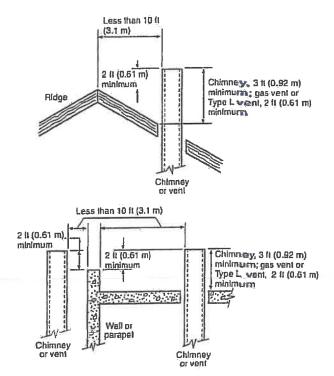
(a) Chimney or Vent Termination Less Than 10 ft (3.1 m) from Ridge, Wall, or Parapet.
